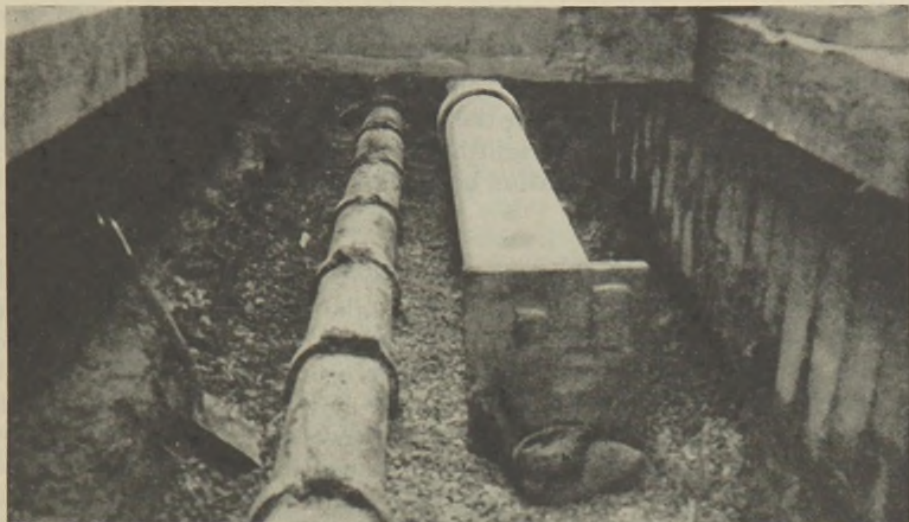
Vitrified clay and asbestos-cement pipe sewers laid in same trench. Note spacing of joints and gravel bedding.
